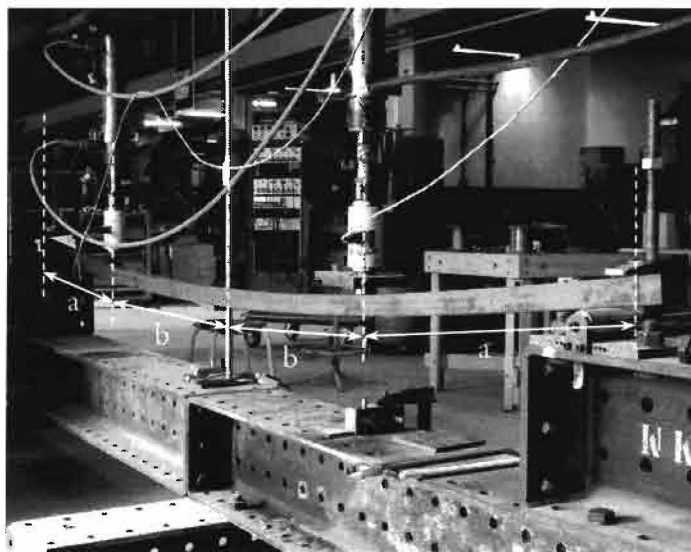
Four point bend test setup for applying a defined out-of-straightness to the steel column of test specimen 1 and 3. Two equal loads were placed symmetrically about the center of the column with a and b equal to 900mm.
